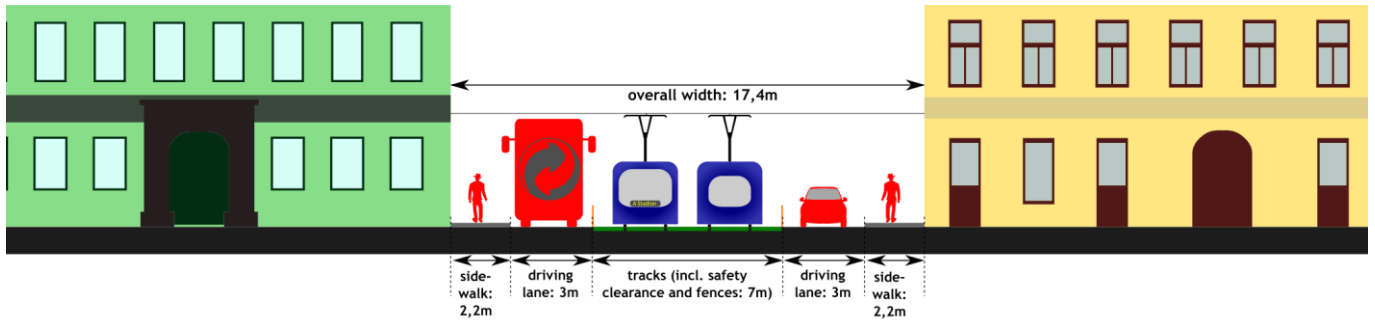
Minimum required street cross-section for a double-track LCRT line with driving lane and sidewalk in both sides (situation apart from level crossings)
